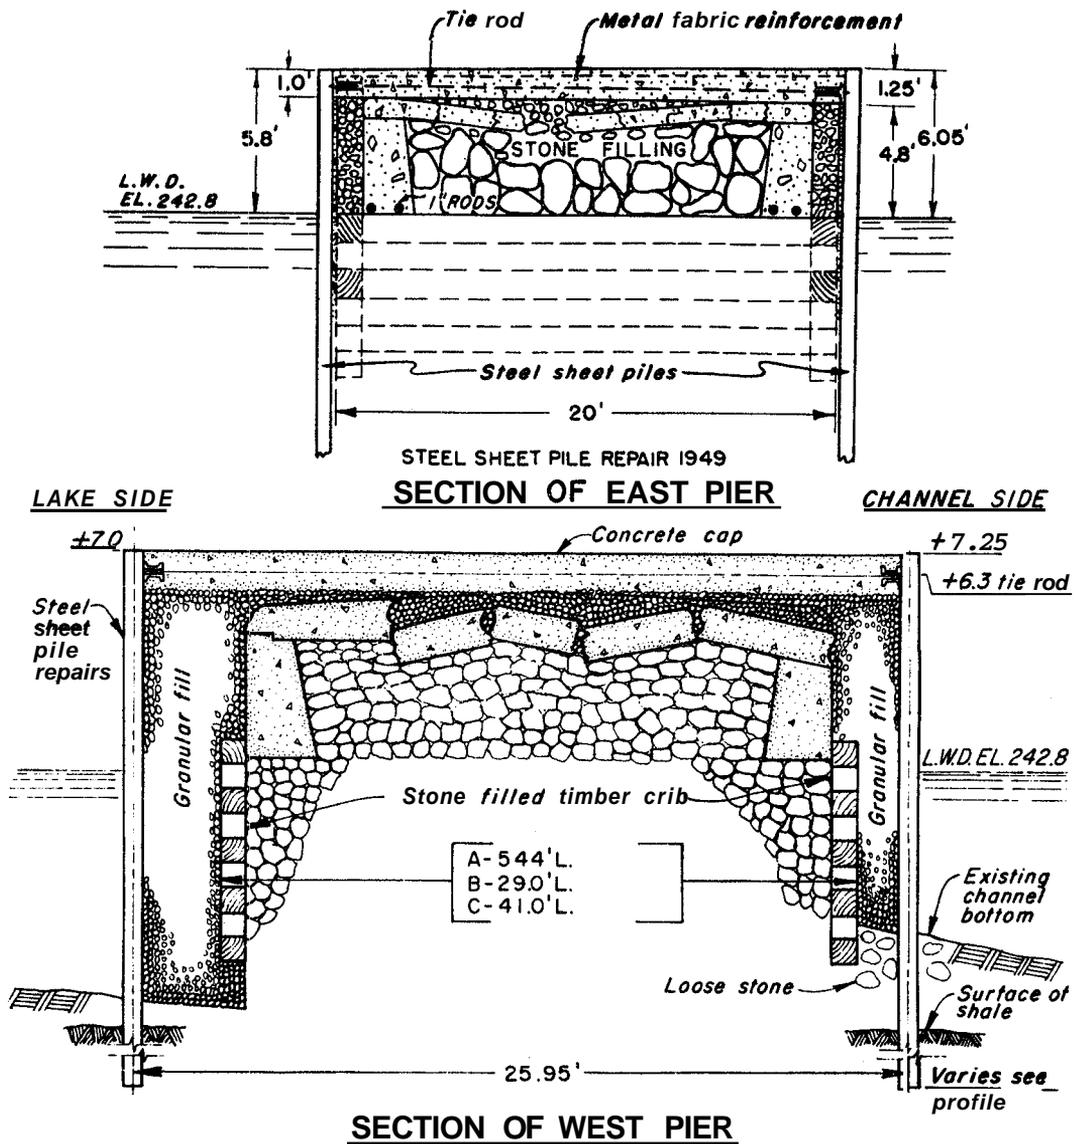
Typical pier cross sections, Olcott Harbor, New York
